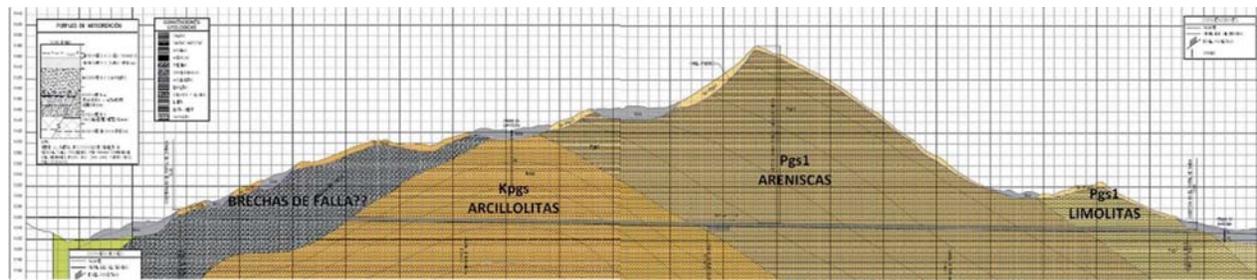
Cut plane of one of the tunnels showing the excavation terrains
